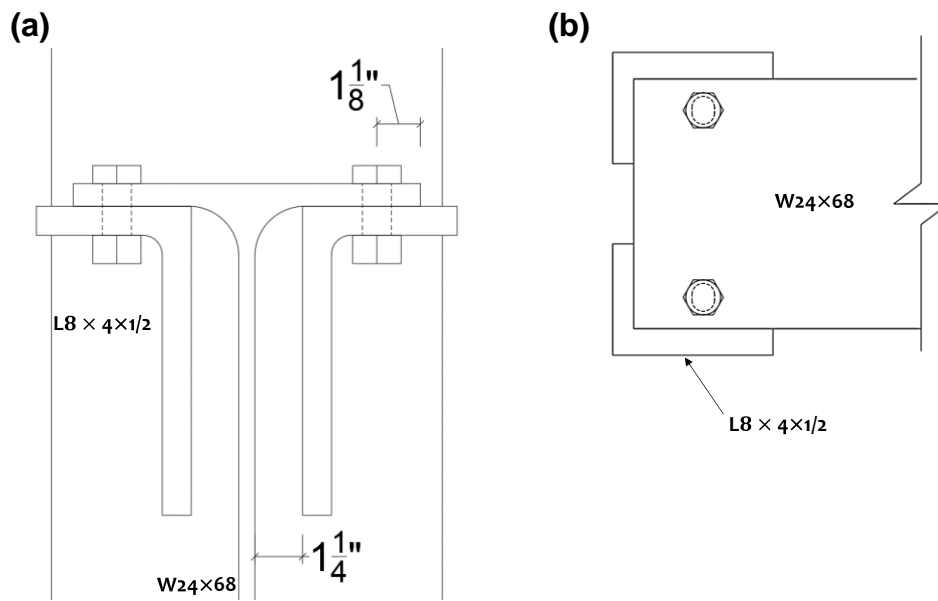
W24x68 Benchmark Drop-In Girder-Column Connection (a) Section View and (b) Plan View
